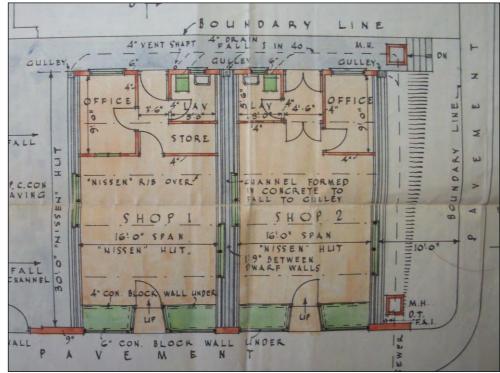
Detailed plan (1947) of the proposed 'Nissen' Hut shops.
